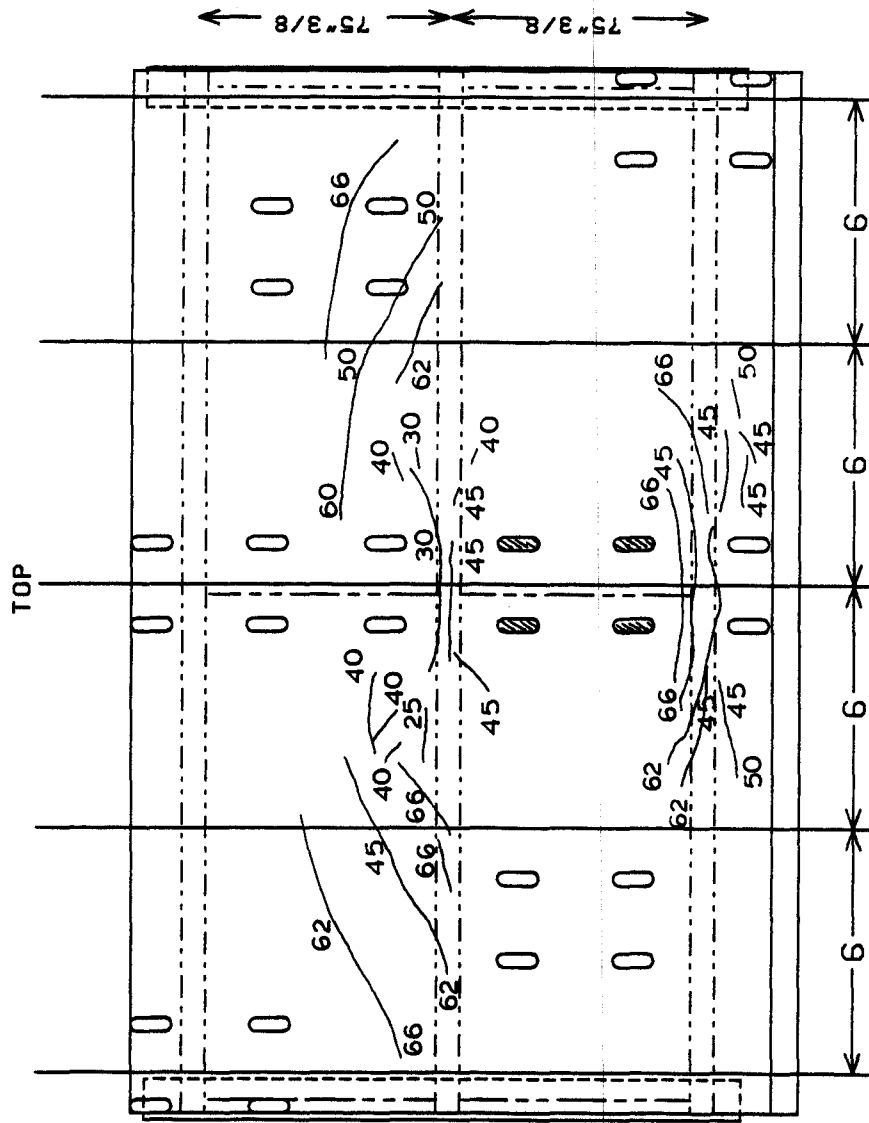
Top Cracking Pattern (Second Bridge - Test No. 3)
